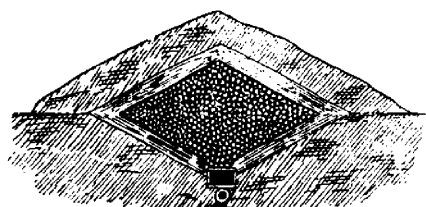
APPLE STORAGE: CROSS SECTION.
